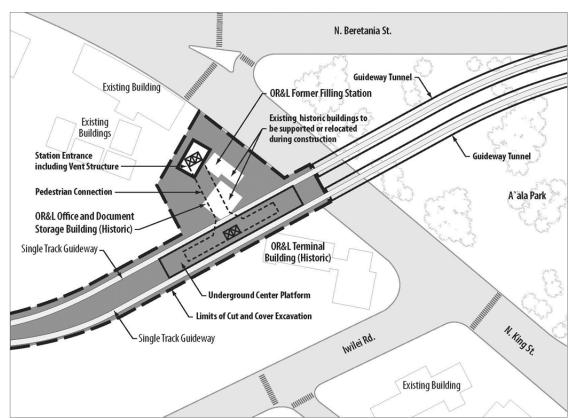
Beretania Street Tunnel Alternative Ka'aahi Street Station
